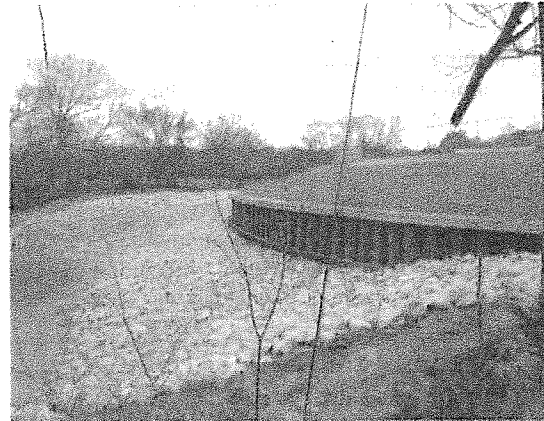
Streambank Protection: Steel sheet piling with rock armor
